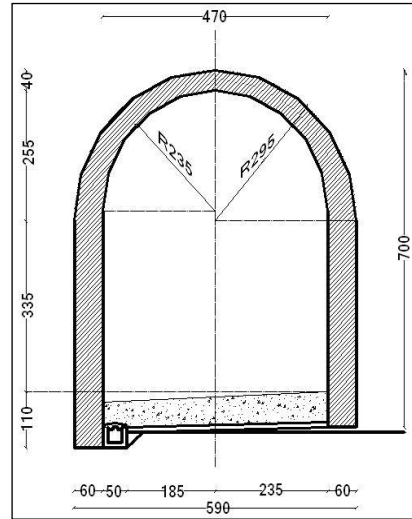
the cross-section of Alsfkon tunnel (dimensions in cm).
